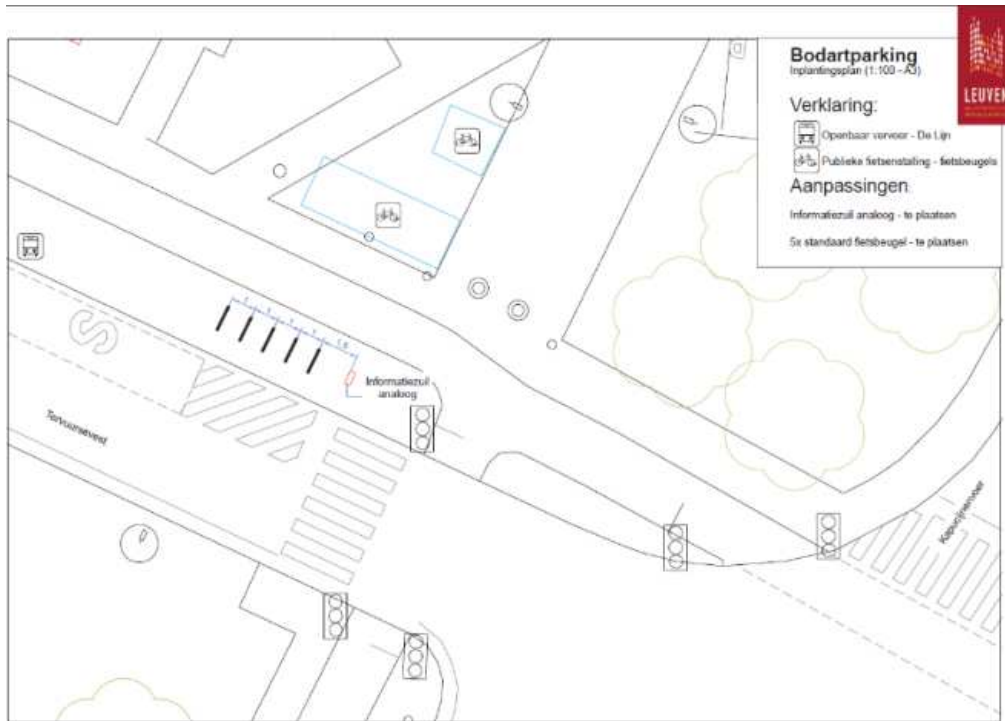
March 2021 - Site plan information pillar of eHUB Bodartparking, implemented since March 2020
